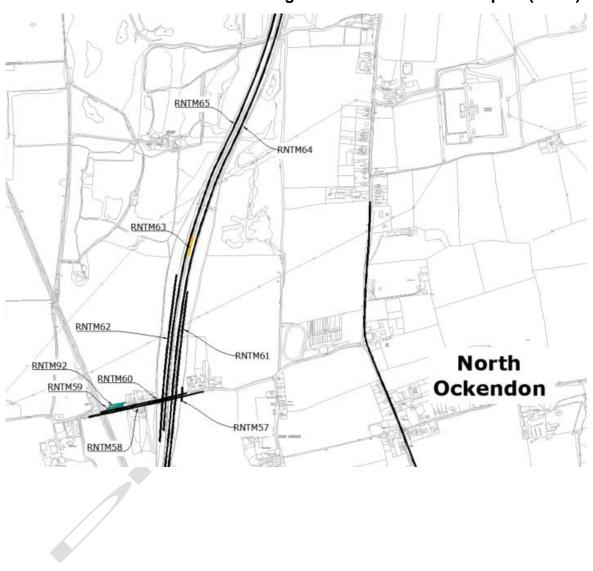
Roads North traffic management measures location plan (6 of 7)
